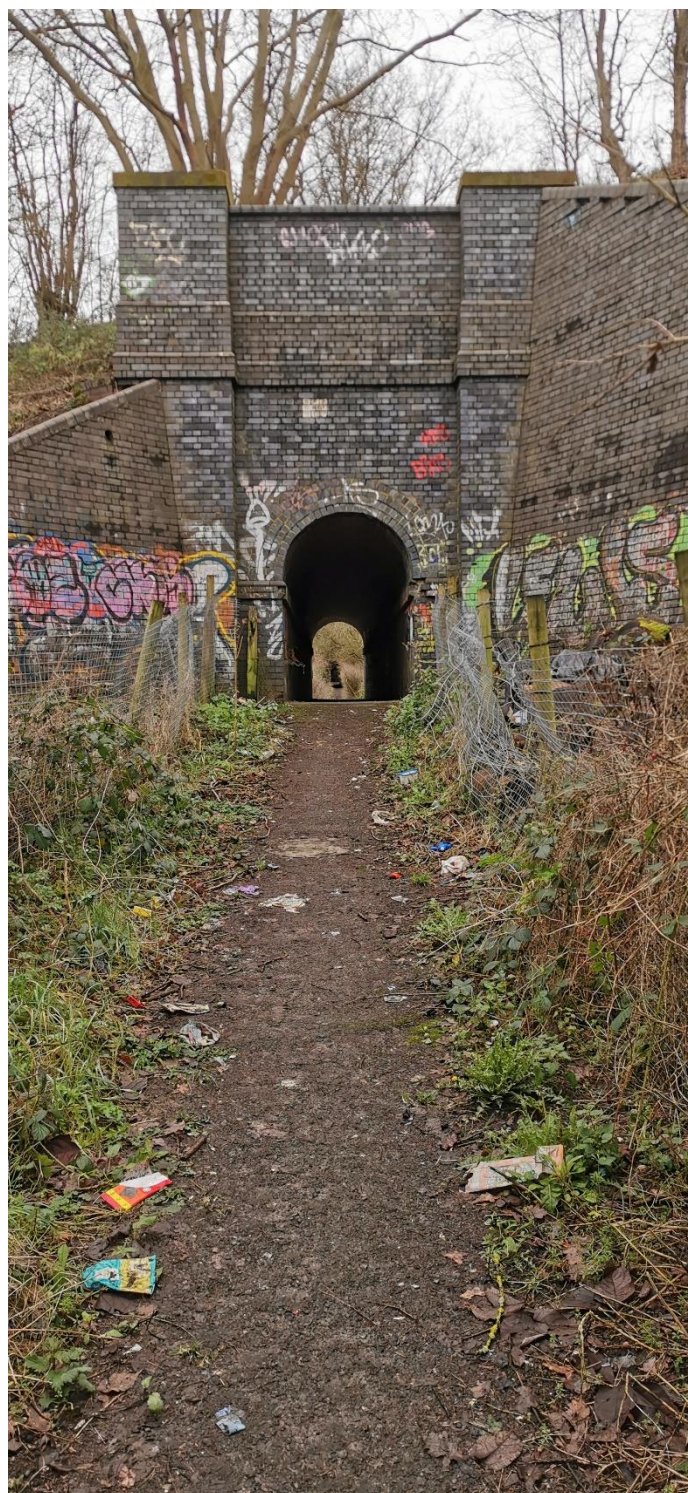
CAP 1 Crossing under the Westcoast Mainline Railway. Author's Photo
